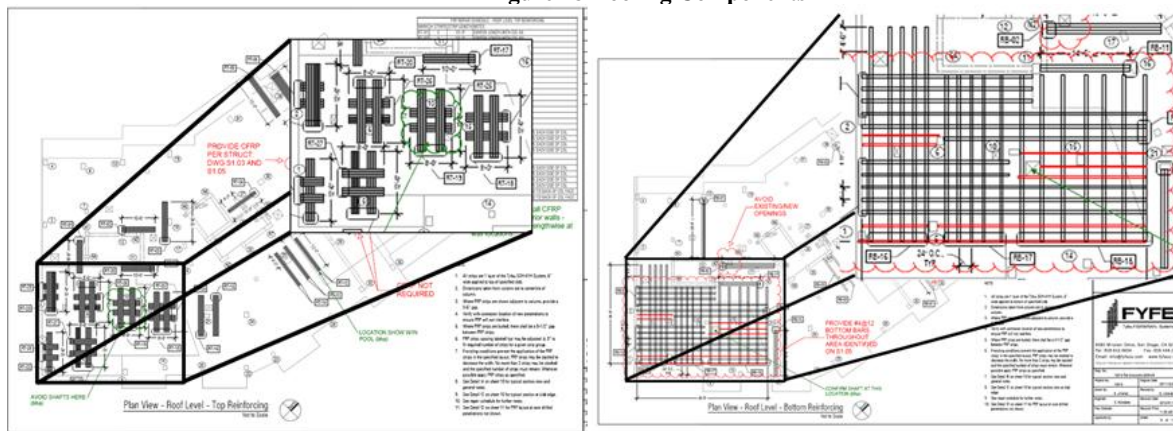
CFRP Plans Top (left) & Bottom (right) Reinforcing
